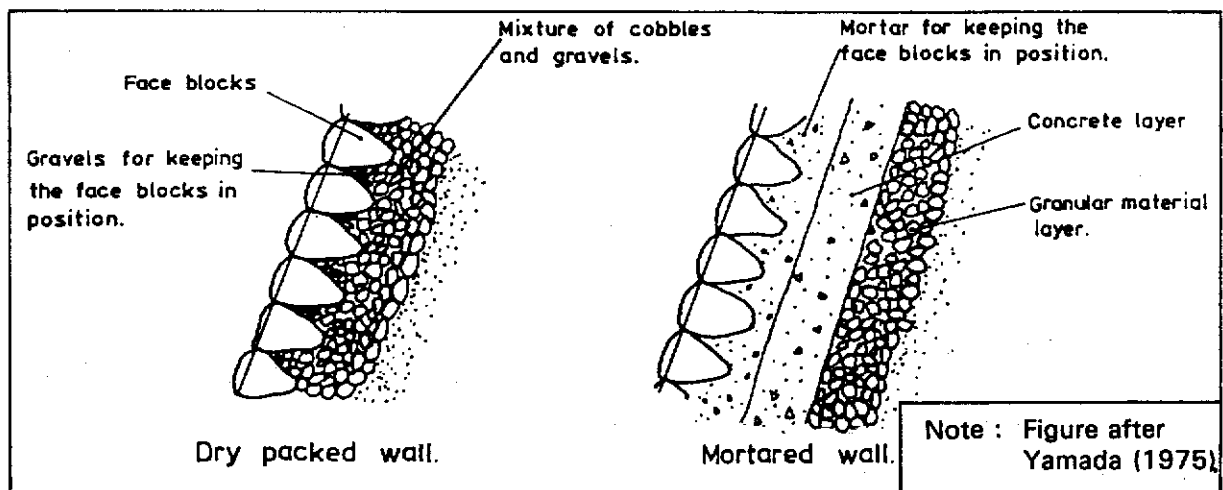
Typical Section of Japanese Stone Masonry Retaining Walls
